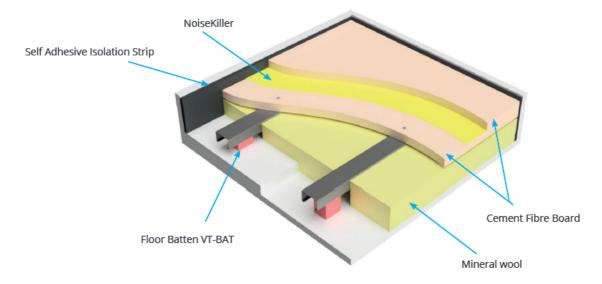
Illustration of a typical installation of the floor system VT-BAT.
